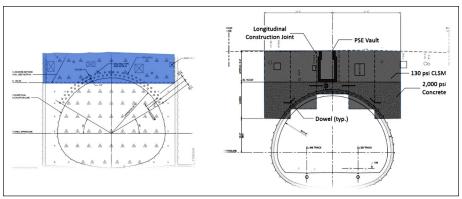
North portal as-bid design (left) and proposed scheme (right)
